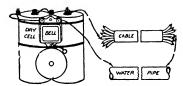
Method of Connecting Dry Cell and Bell for Testing
